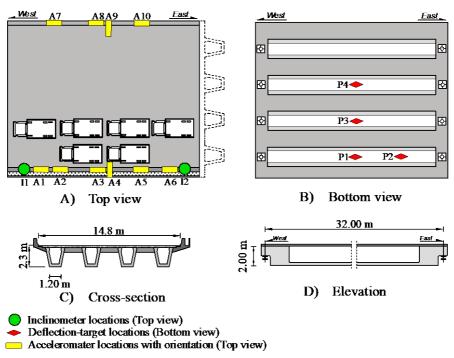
Bridge geometry showing sensor locations and the static load test: A) Top view; B) Bottom view; C) Cross-section; D) Elevation.
